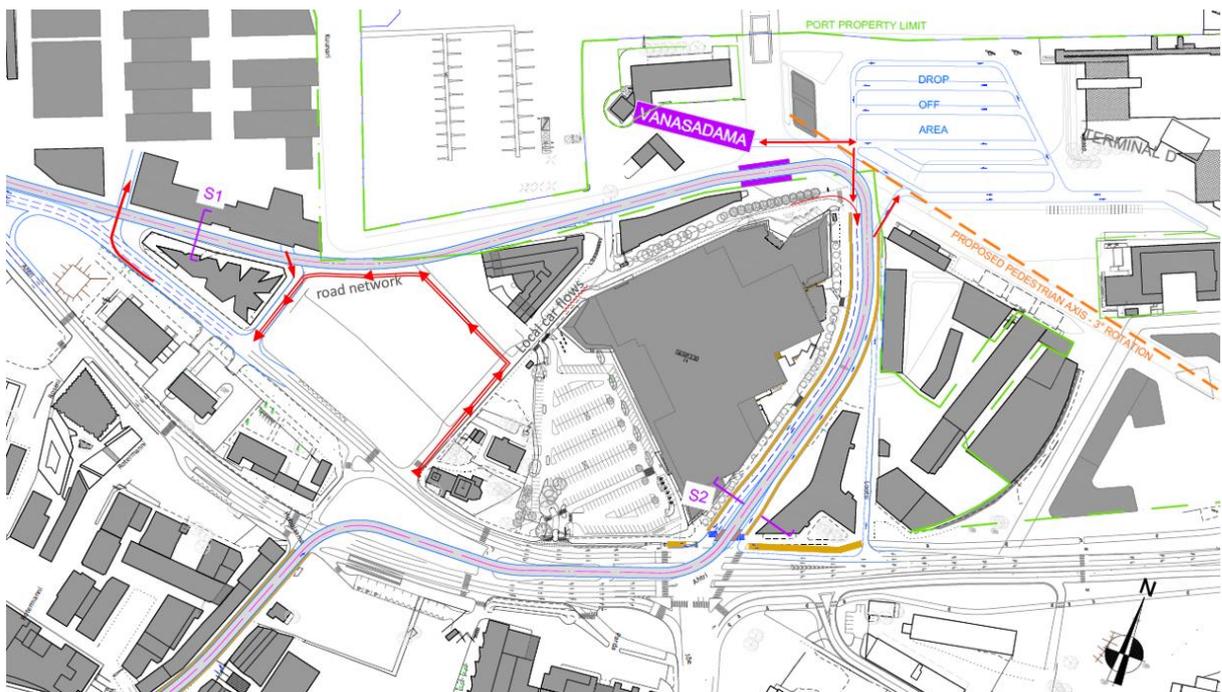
Tram solution – plan in Laeva Street with proposed road network – Egis
